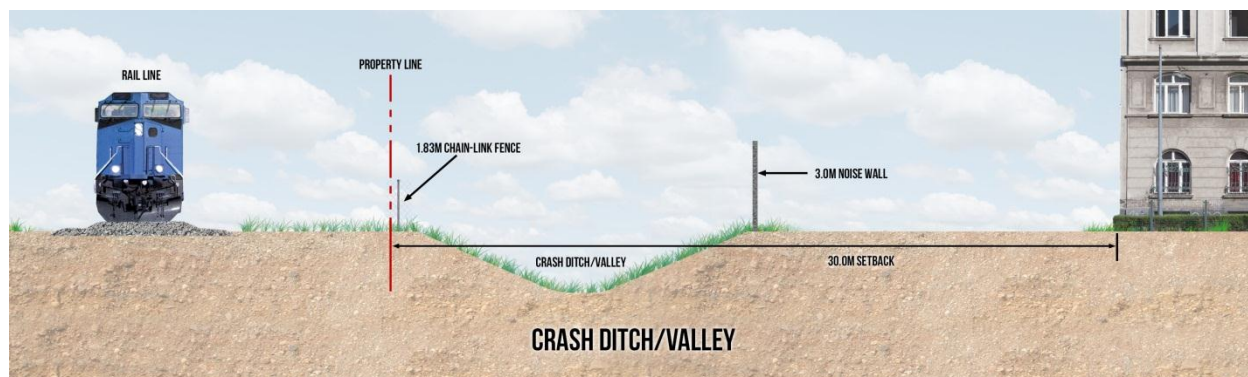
Crash Ditch/Valley Plus 30 m Building Setback
